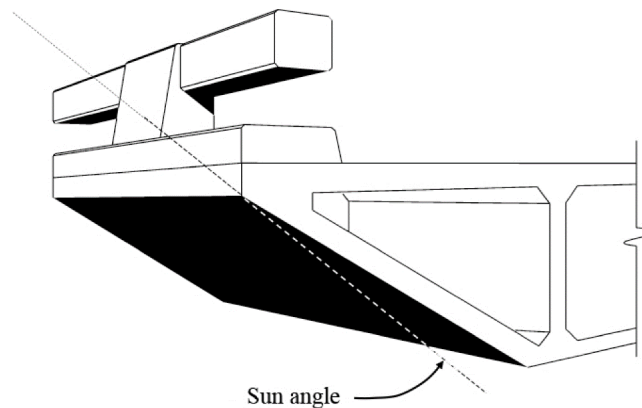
Shadow on Sloped Hammerhead Box Girder
